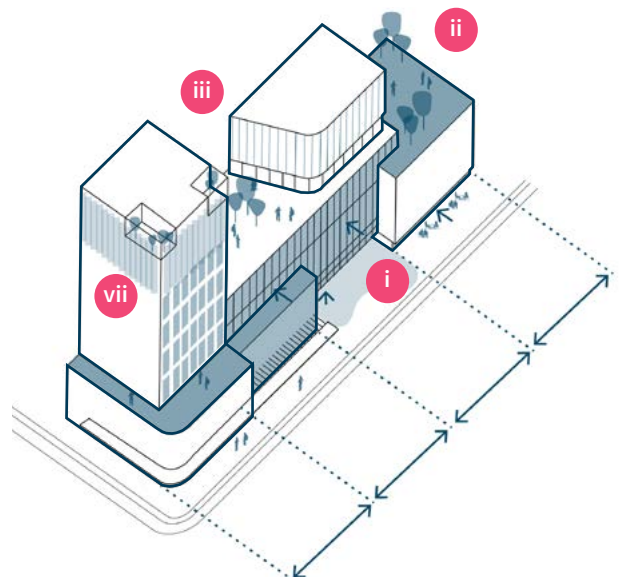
Façade articulation to consider human-scale, street rhythm and visual interest.
